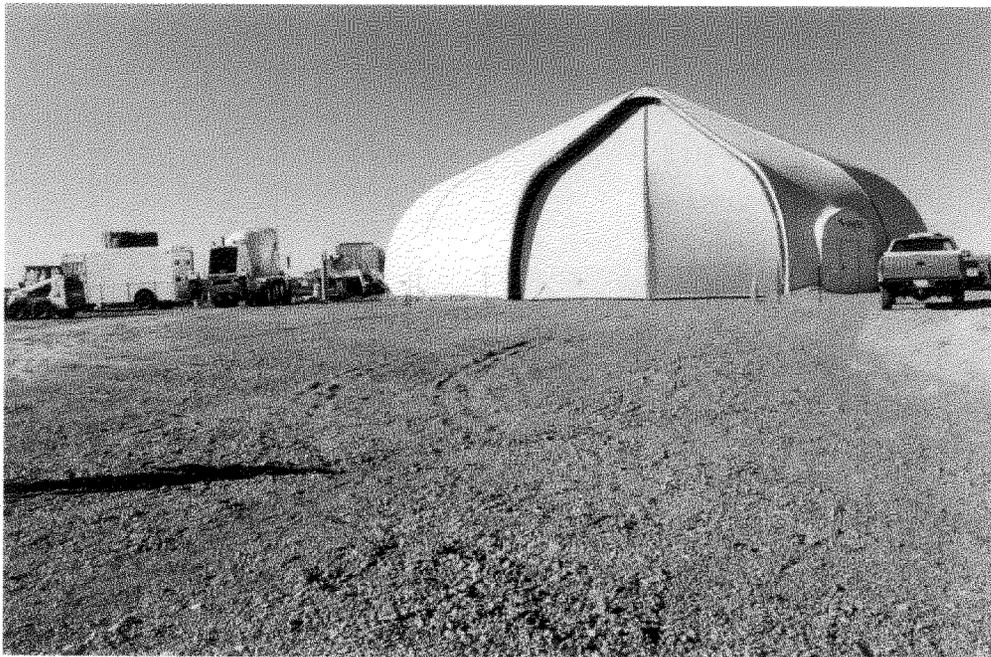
Weather structure constructed over the pit (Photo PNOL-520-1-1).
